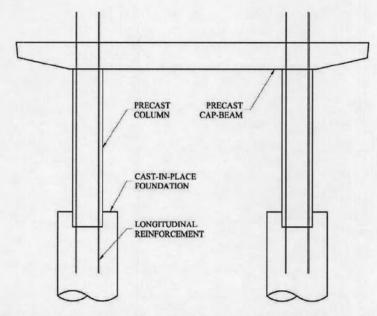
Elevation of reinforced concrete system pier (Hieber et al., 2005)
